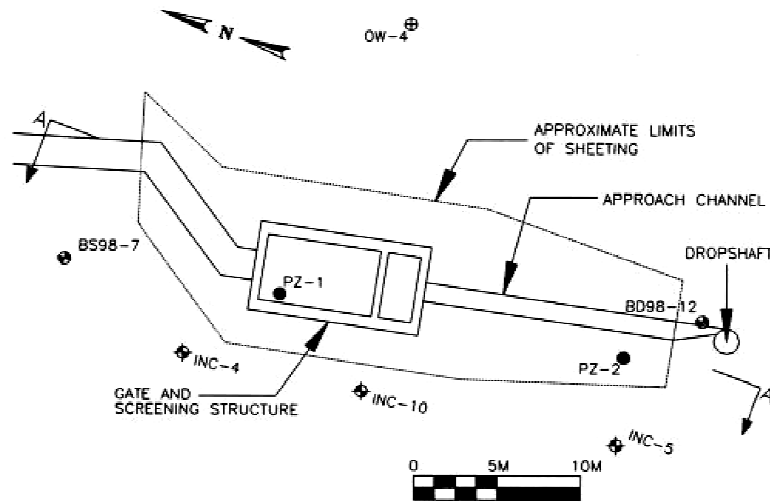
Site plan showing extent of excavation for gate and screening structure and locations of boring and geotechnical instrumentation (Bradshaw, Miller and Baxter 2007).
